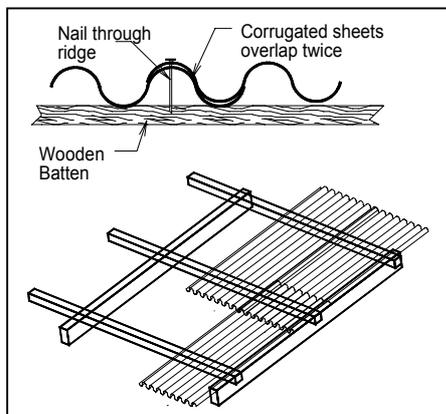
Suggested techniques for assembly of corrugated steel roof
